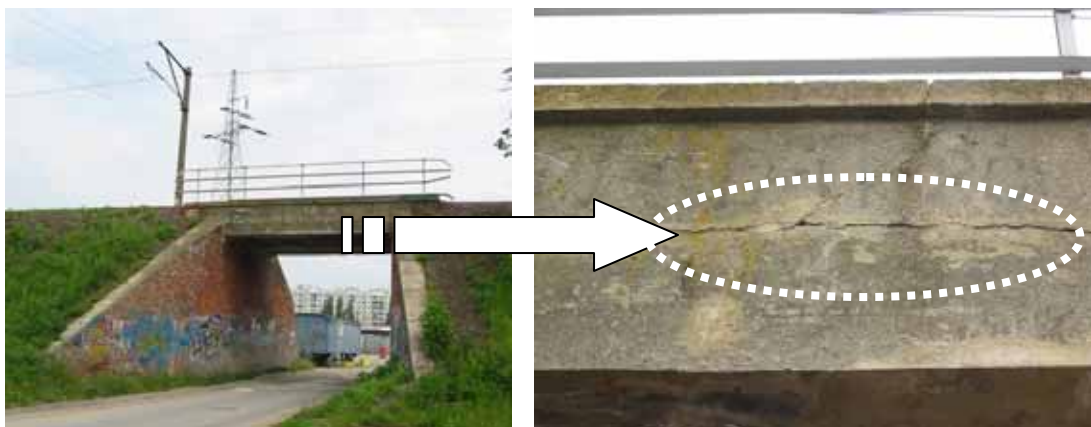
Example of discontinuity: longitudinal crack in concrete (photographed by the Author)
